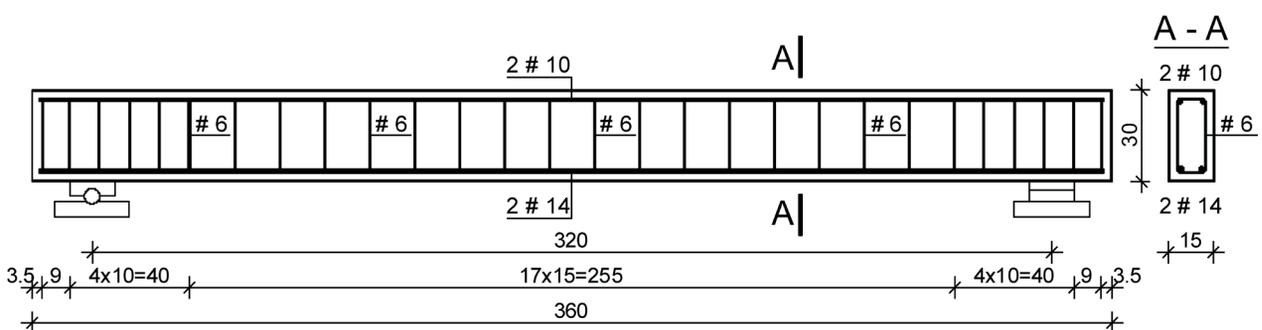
The dimensions and arrangement of rebars in the RC beams (dimensions in cm)
